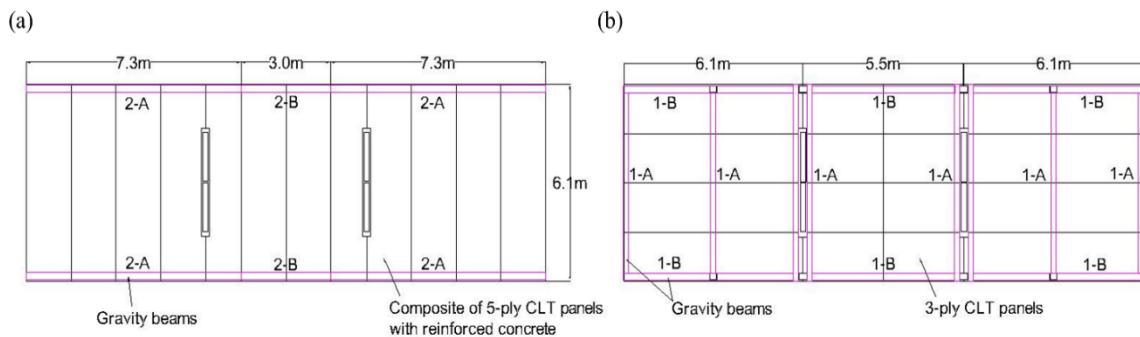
Plan view of CLT panels: (a) Floor, (b) Roof
